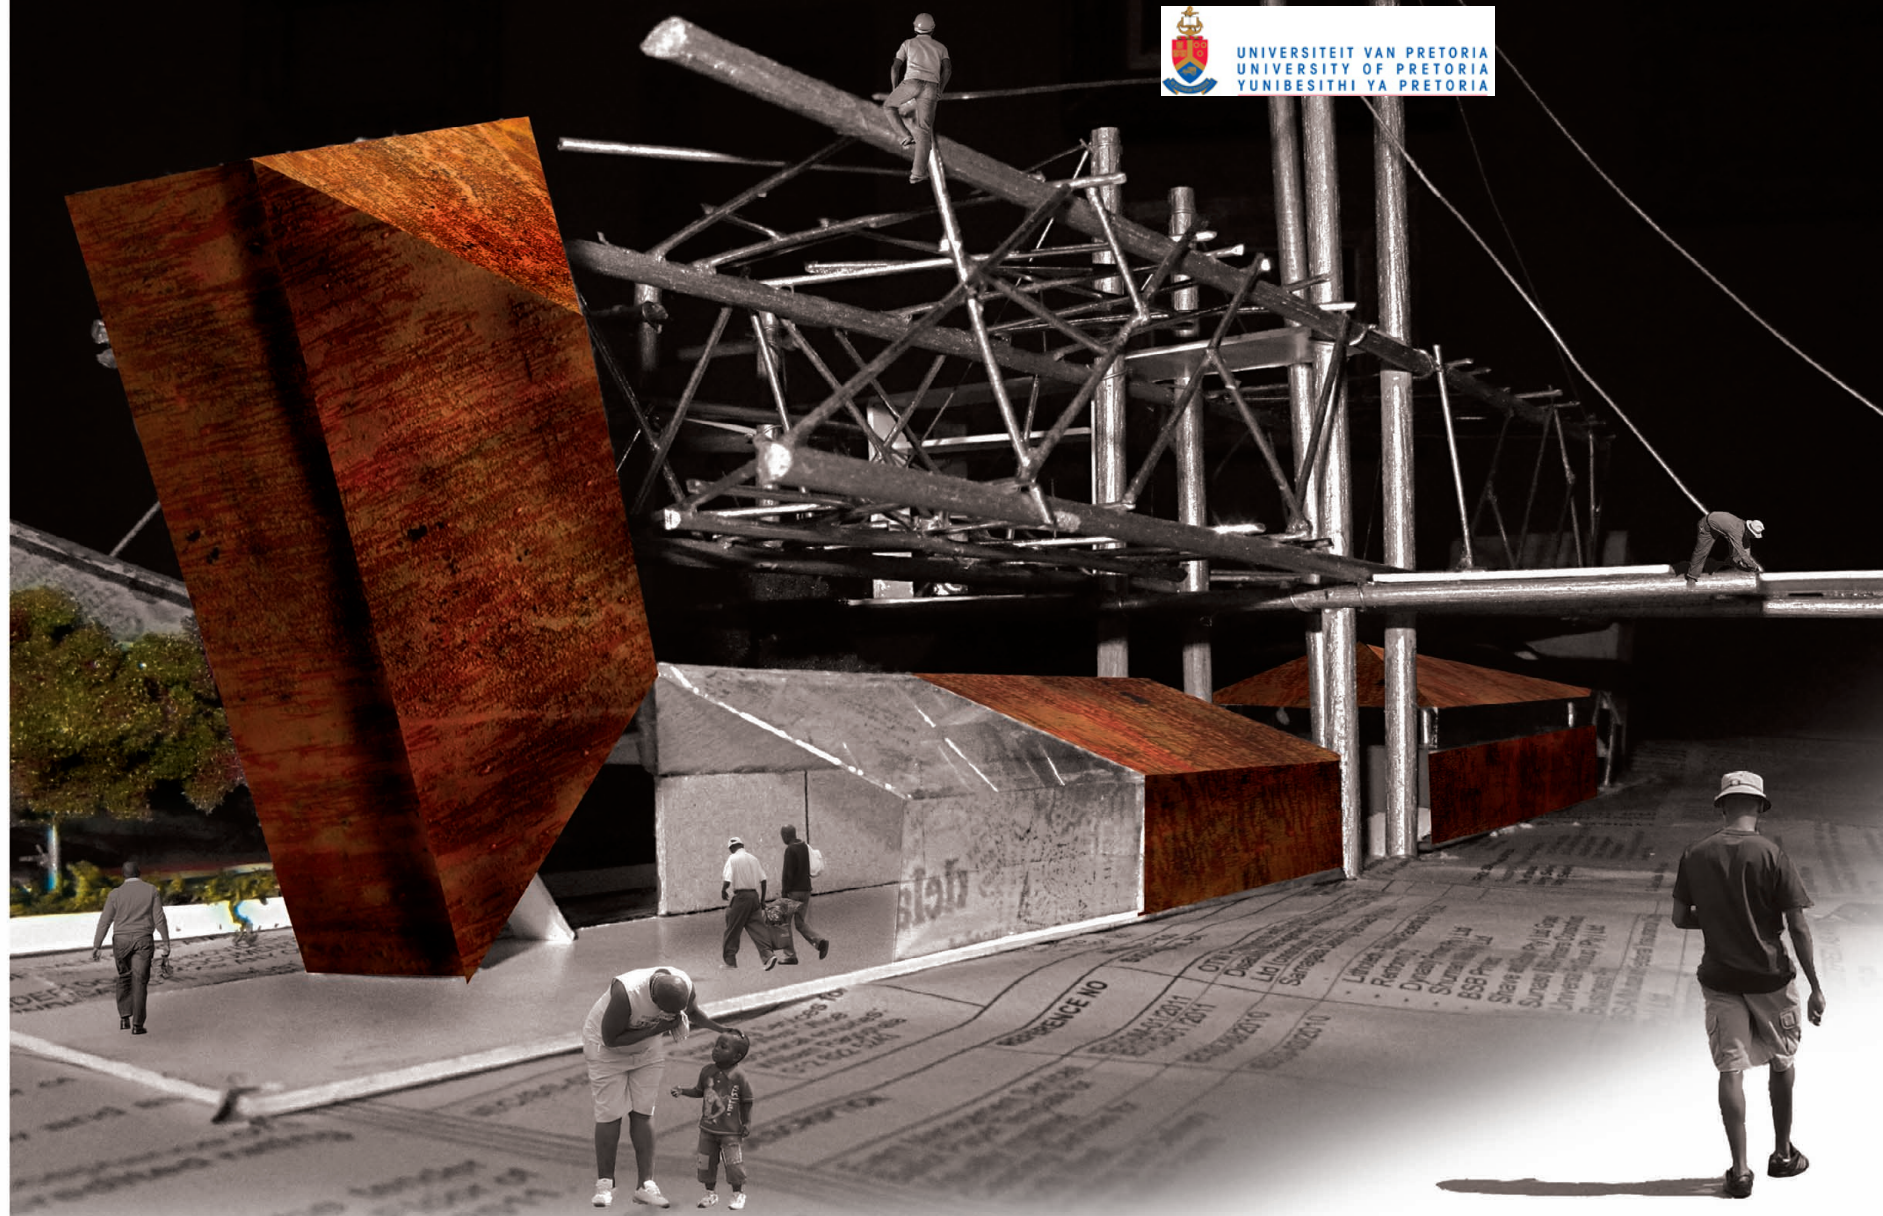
concept model illustrating perspective view of southern facade (principal facade)
